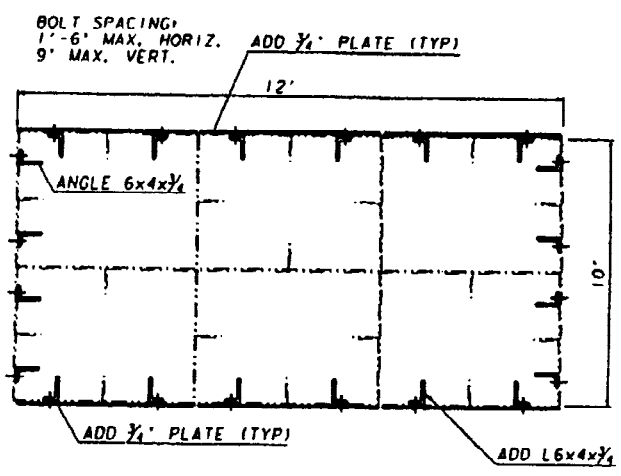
STEEL MULTI-CELL TOWER RETROFIT
